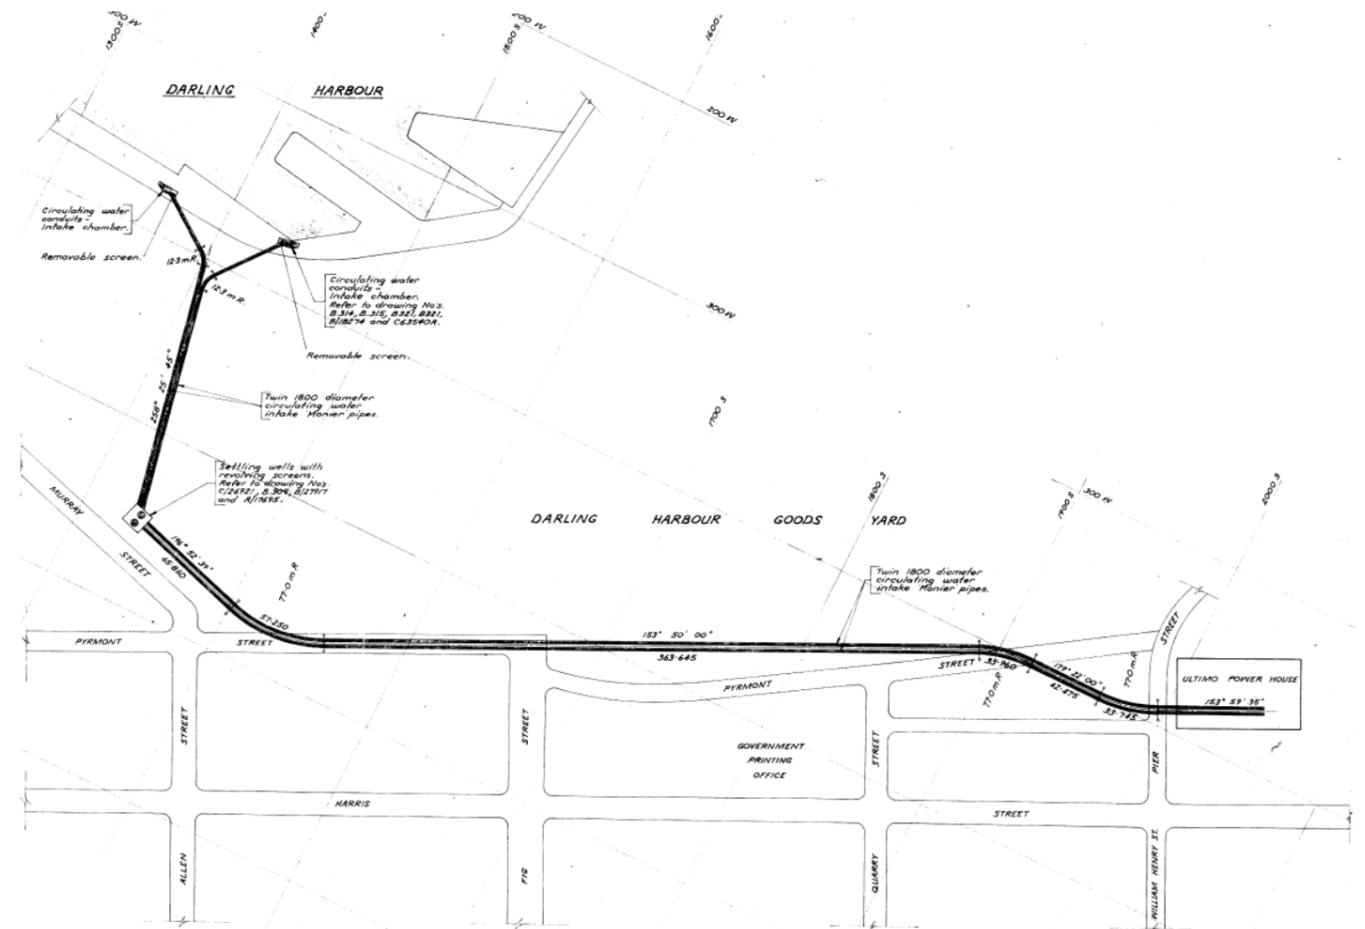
Plan of Powerhouse Seawater Conduits, November 1982 (Source: Government Architect NSW C82-079G/SC-001)
